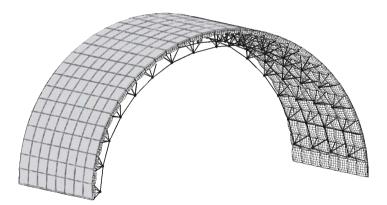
Cylindrical shell composed of semi-rigid, translucent cushions
